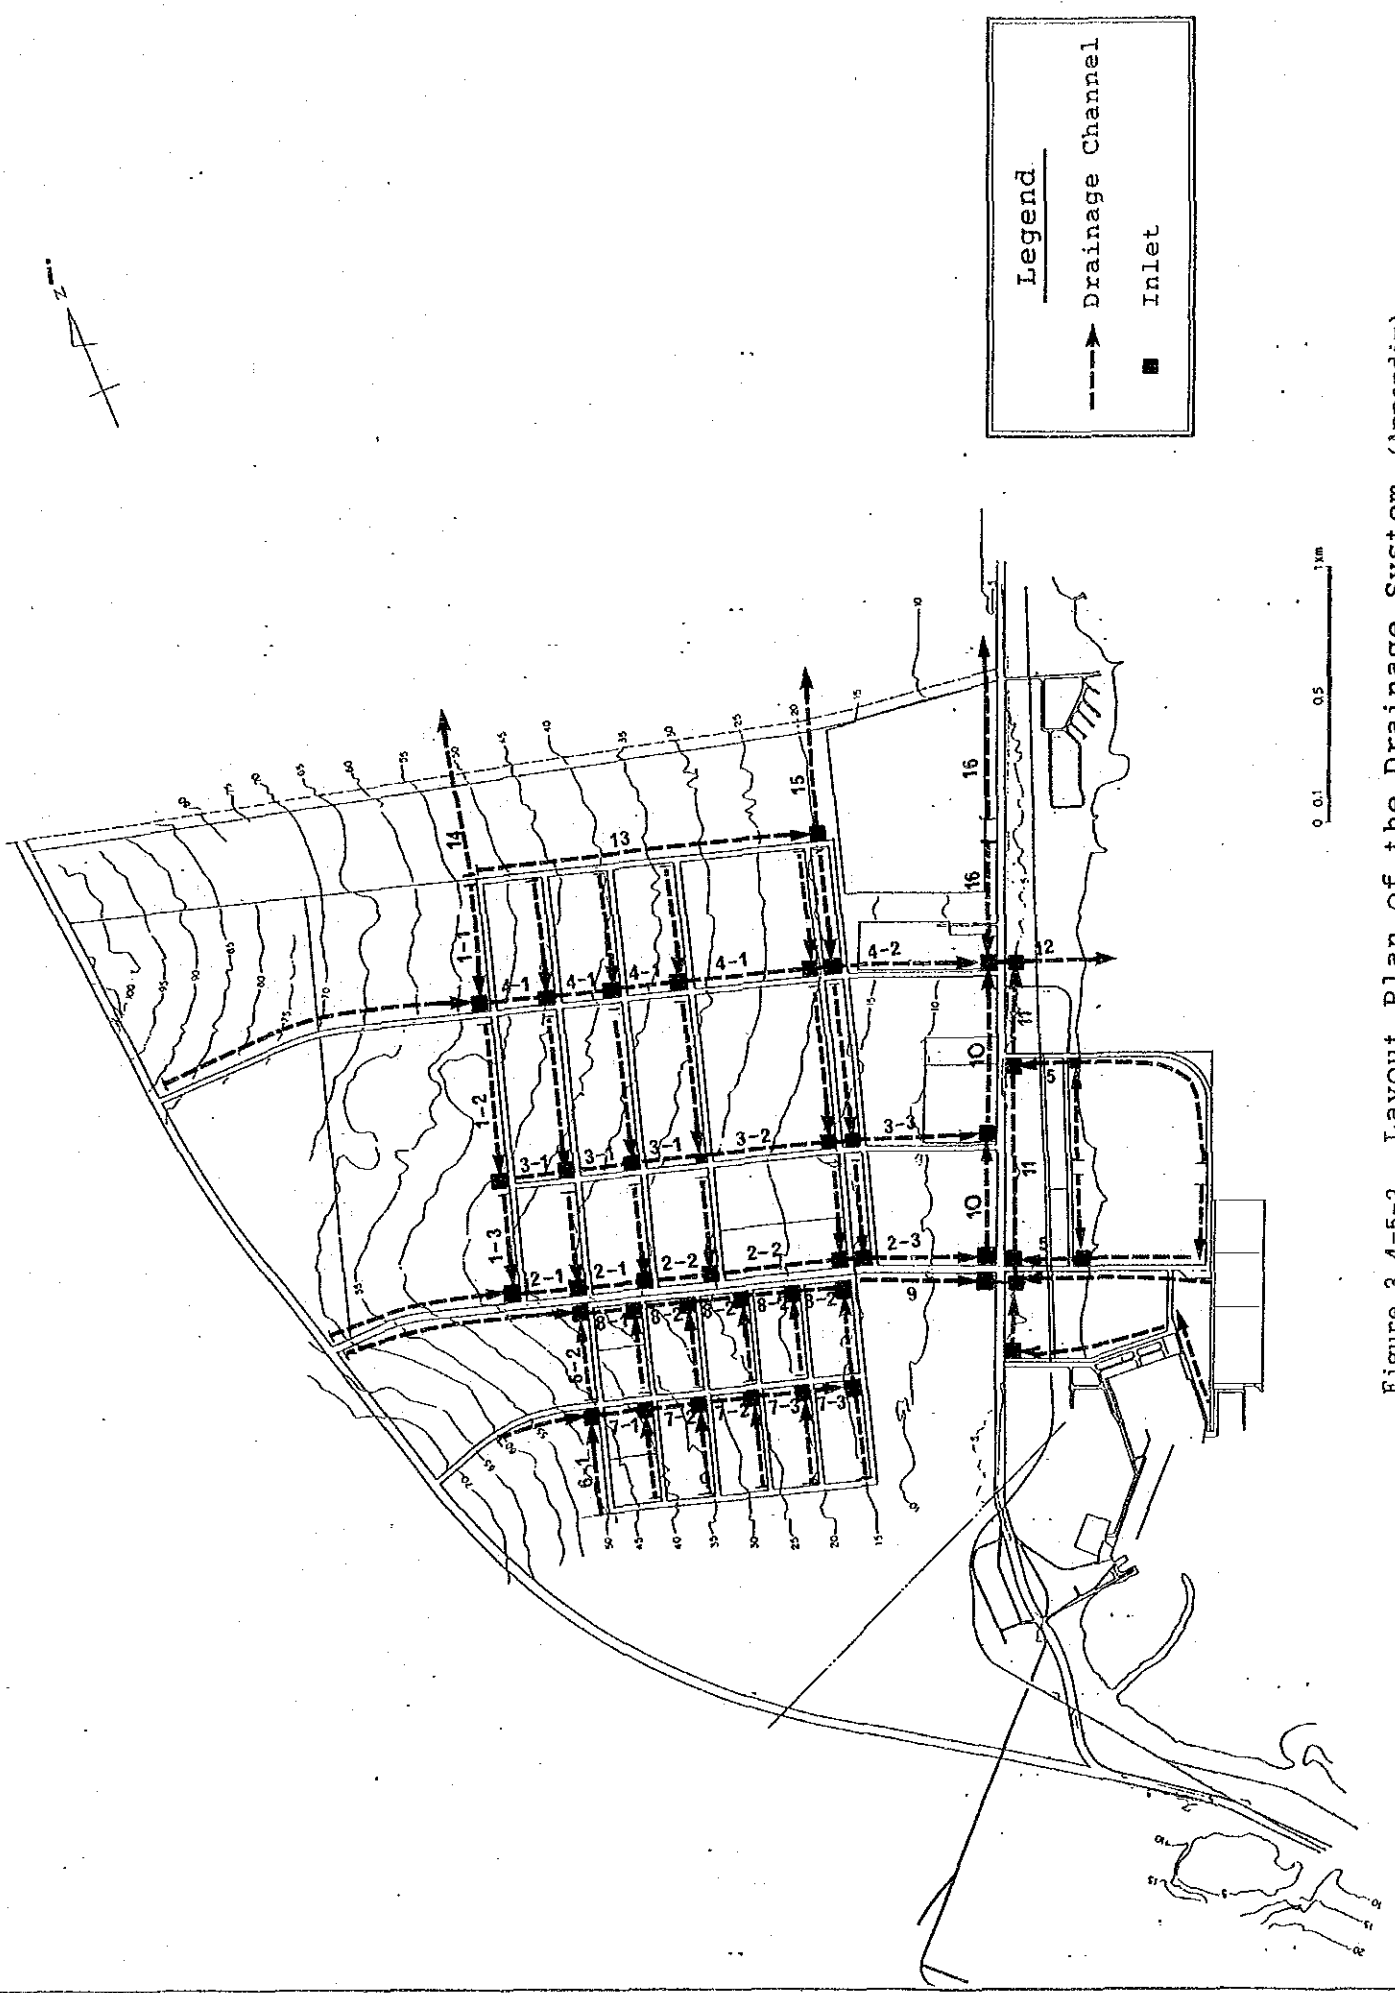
Layout Plan of the Drainage System (Appendix)
